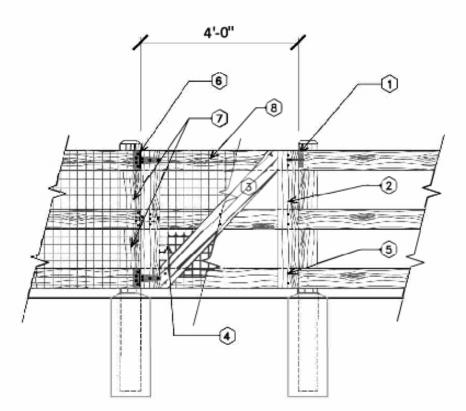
C - Cedar Rail Fence Gate - INSIDE See Section 2.9 for Details
